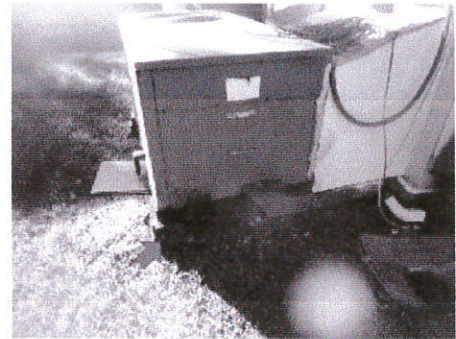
IMPROPERLY FLASHED ROOF.
